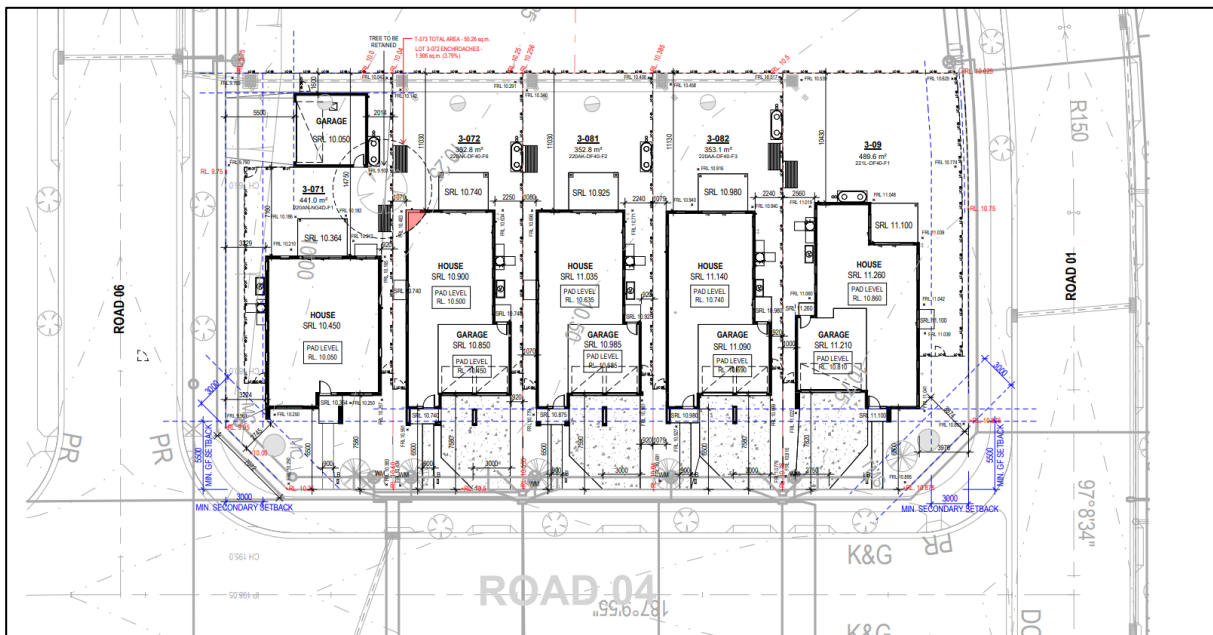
SITE PLAN FOR PROPOSED DEVELOPMENT (PROPOSED LOTS 3-09, 3-071, 3-072, 3-081, 3-082)
